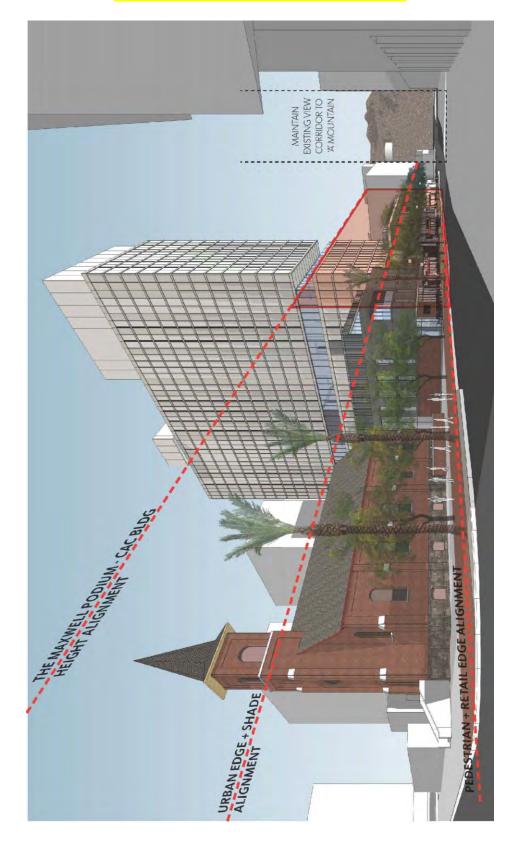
EXHIBIT K COLLEGE AVENUE BUILDING AND SITE LINES
